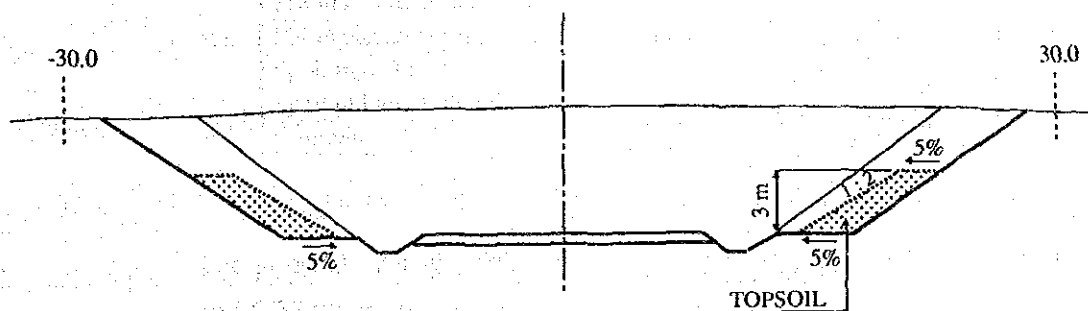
Standard Cross Section of Side Borrow Section
